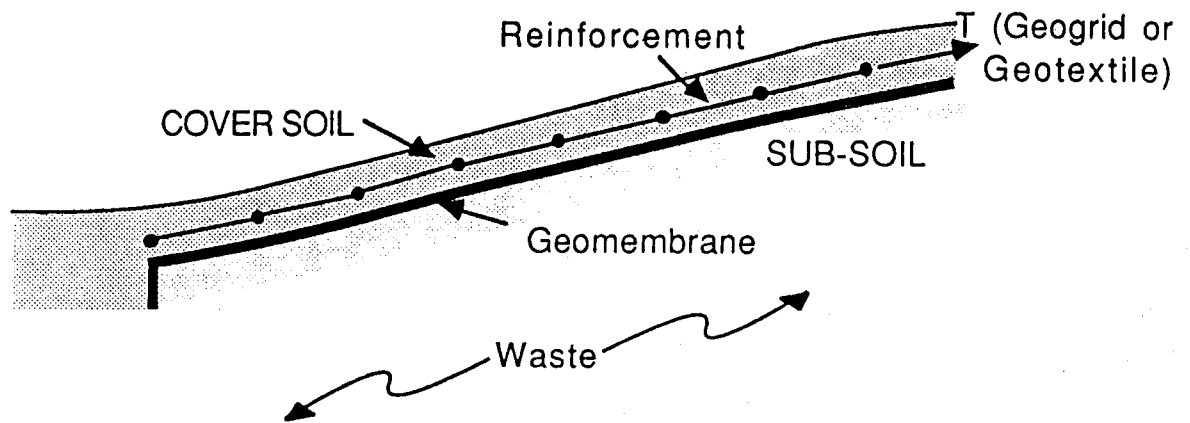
' - Geogrid or Geotextile Reinforcement of a Cover Soil Above Waste and of a Cover Soil on a Geomembrane Beneath Waste
